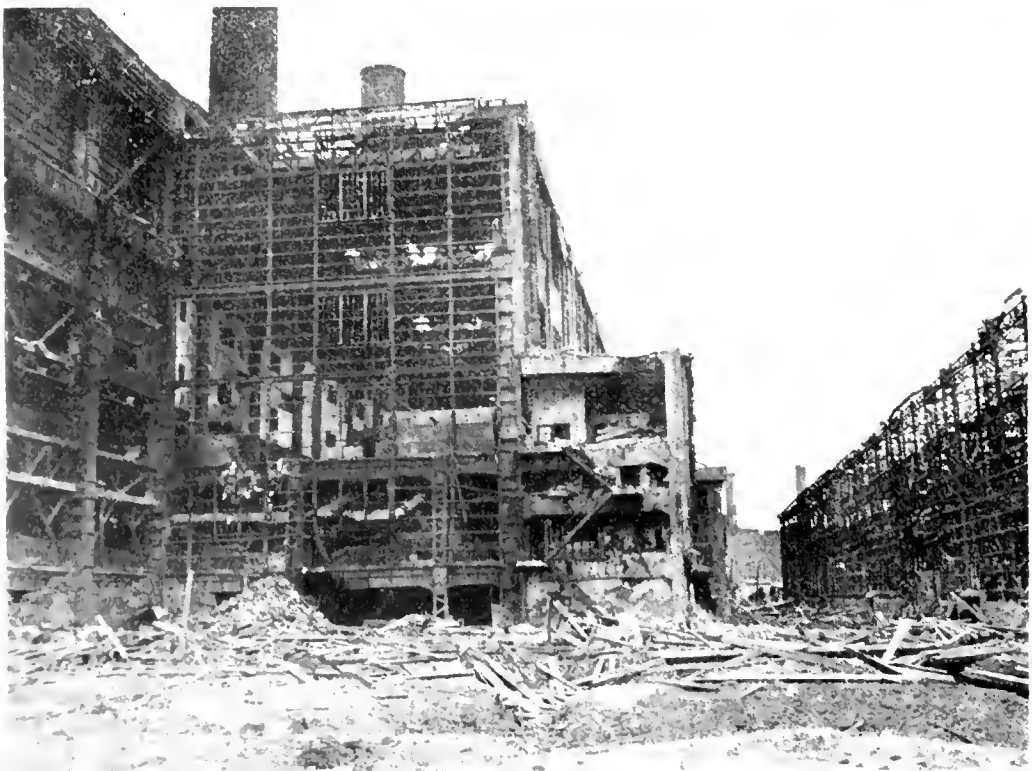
Closer view of damaged boiler, turbogenerator, and control section of plant at left and indoor transformer and switching building at right looking north
